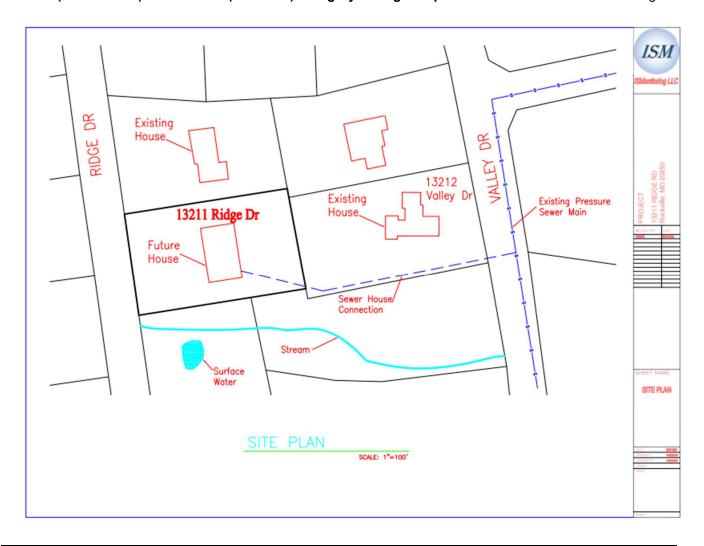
Site Map and proposed sewer house connection provided by the applicant of 24-TRV-04A.
